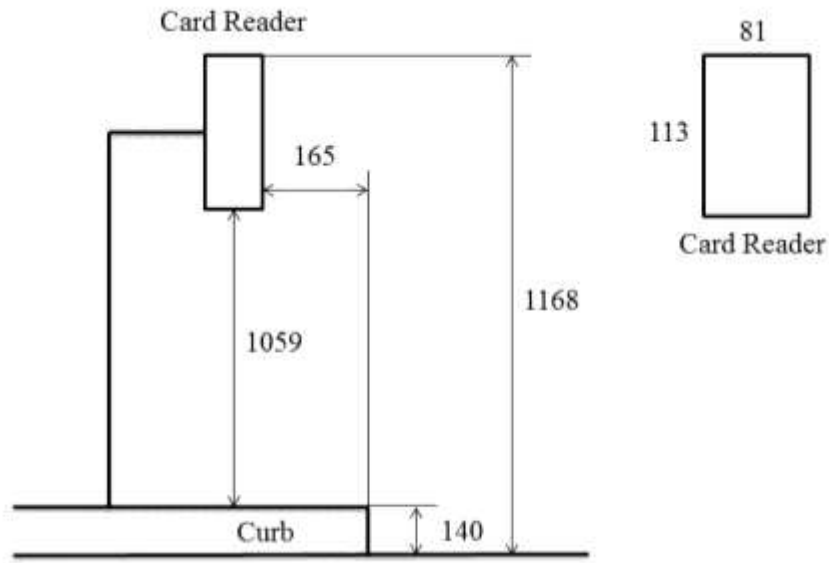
Dimensions (in mm) of the card reader at the entrance to the parking deck.
